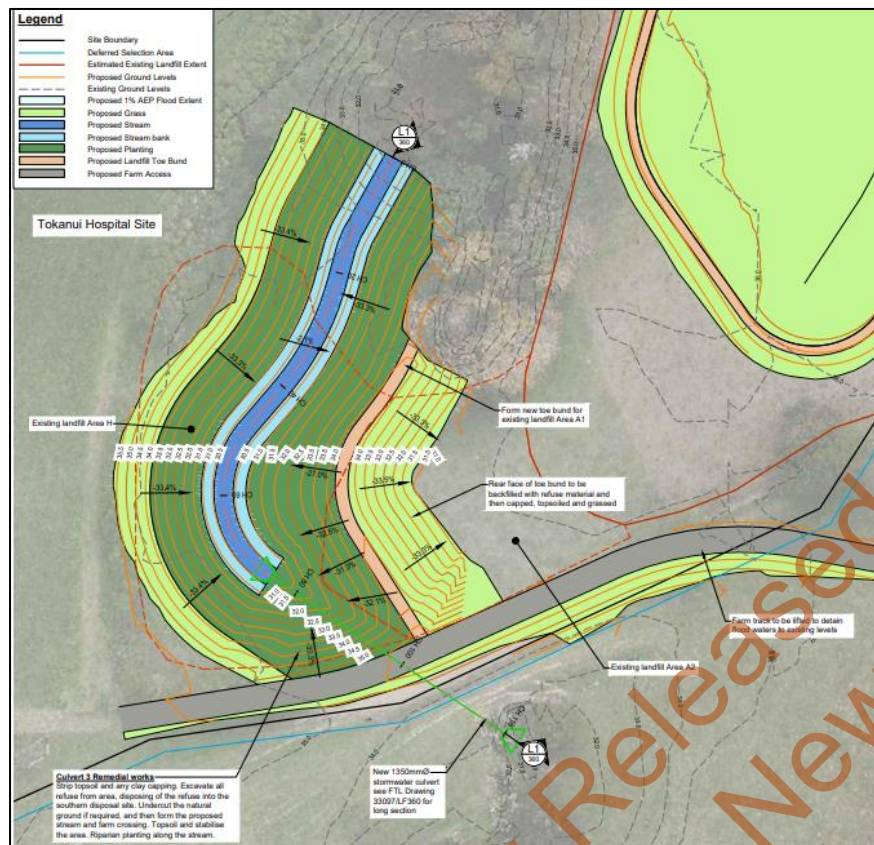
Proposed realignment of Wharekōrino Stream and new culvert
